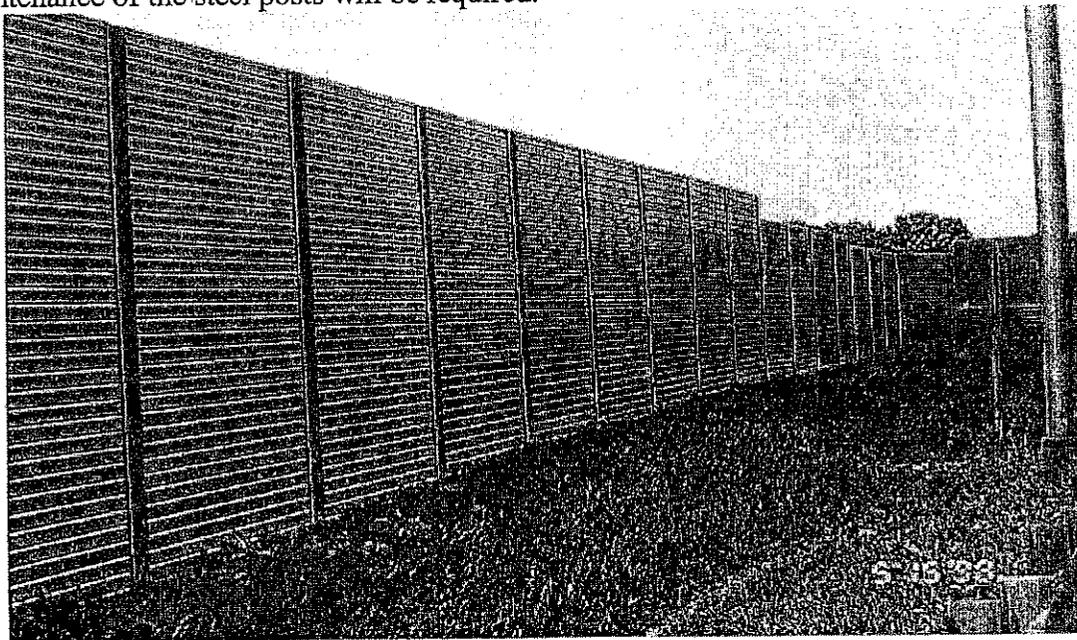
Carsonite Barrier, I-294, view of construction details.
